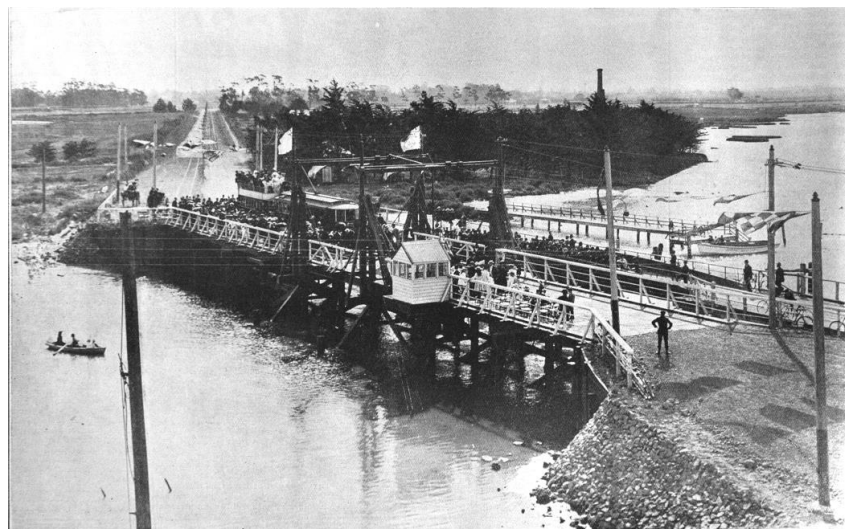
The first electric tram to cross the new bridge over the Heathcote River, 20 March 1907 (The Weekly Press photograph, Bishop collection, Canterbury Museum).
